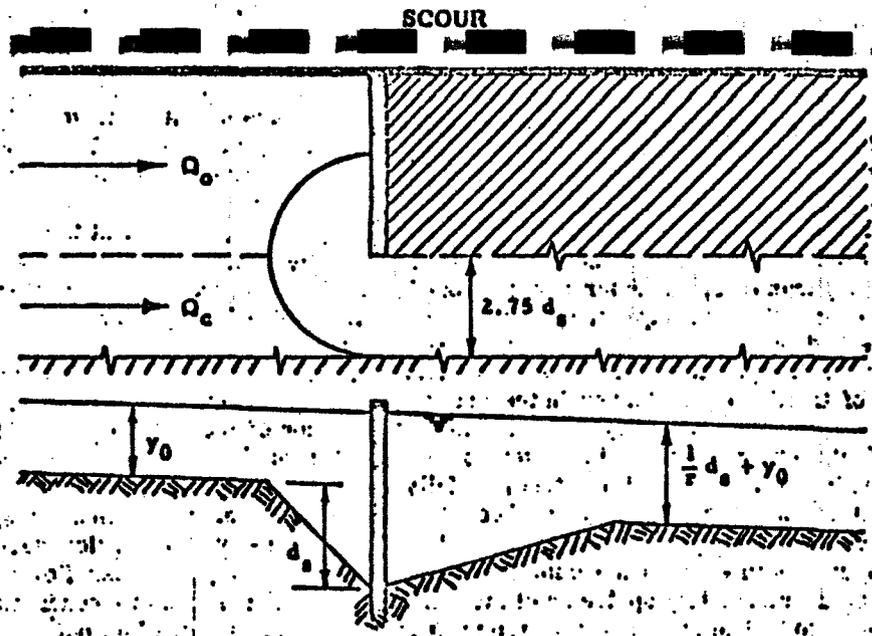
DEFINITION SKETCH OF OVERBANK CONSTRUCTION
